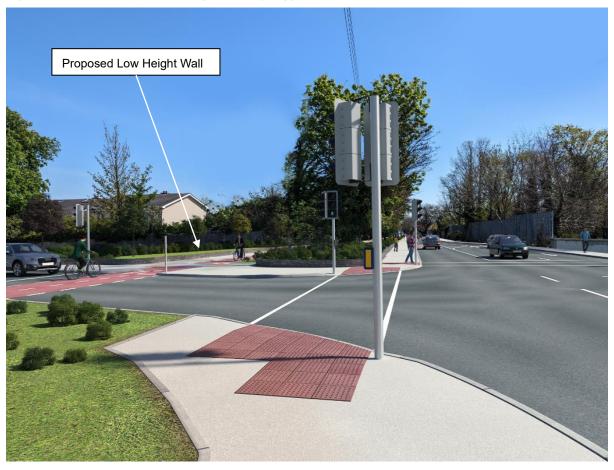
Proposed Scheme at Sallynoggin Road / Rochestown Avenue
